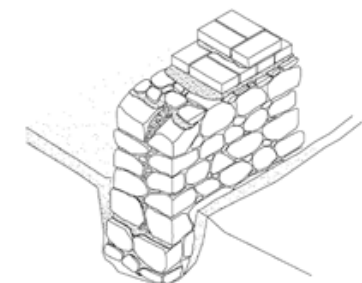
Mud wall built on stone foundation, Mecca and Dipasquale, 2009
